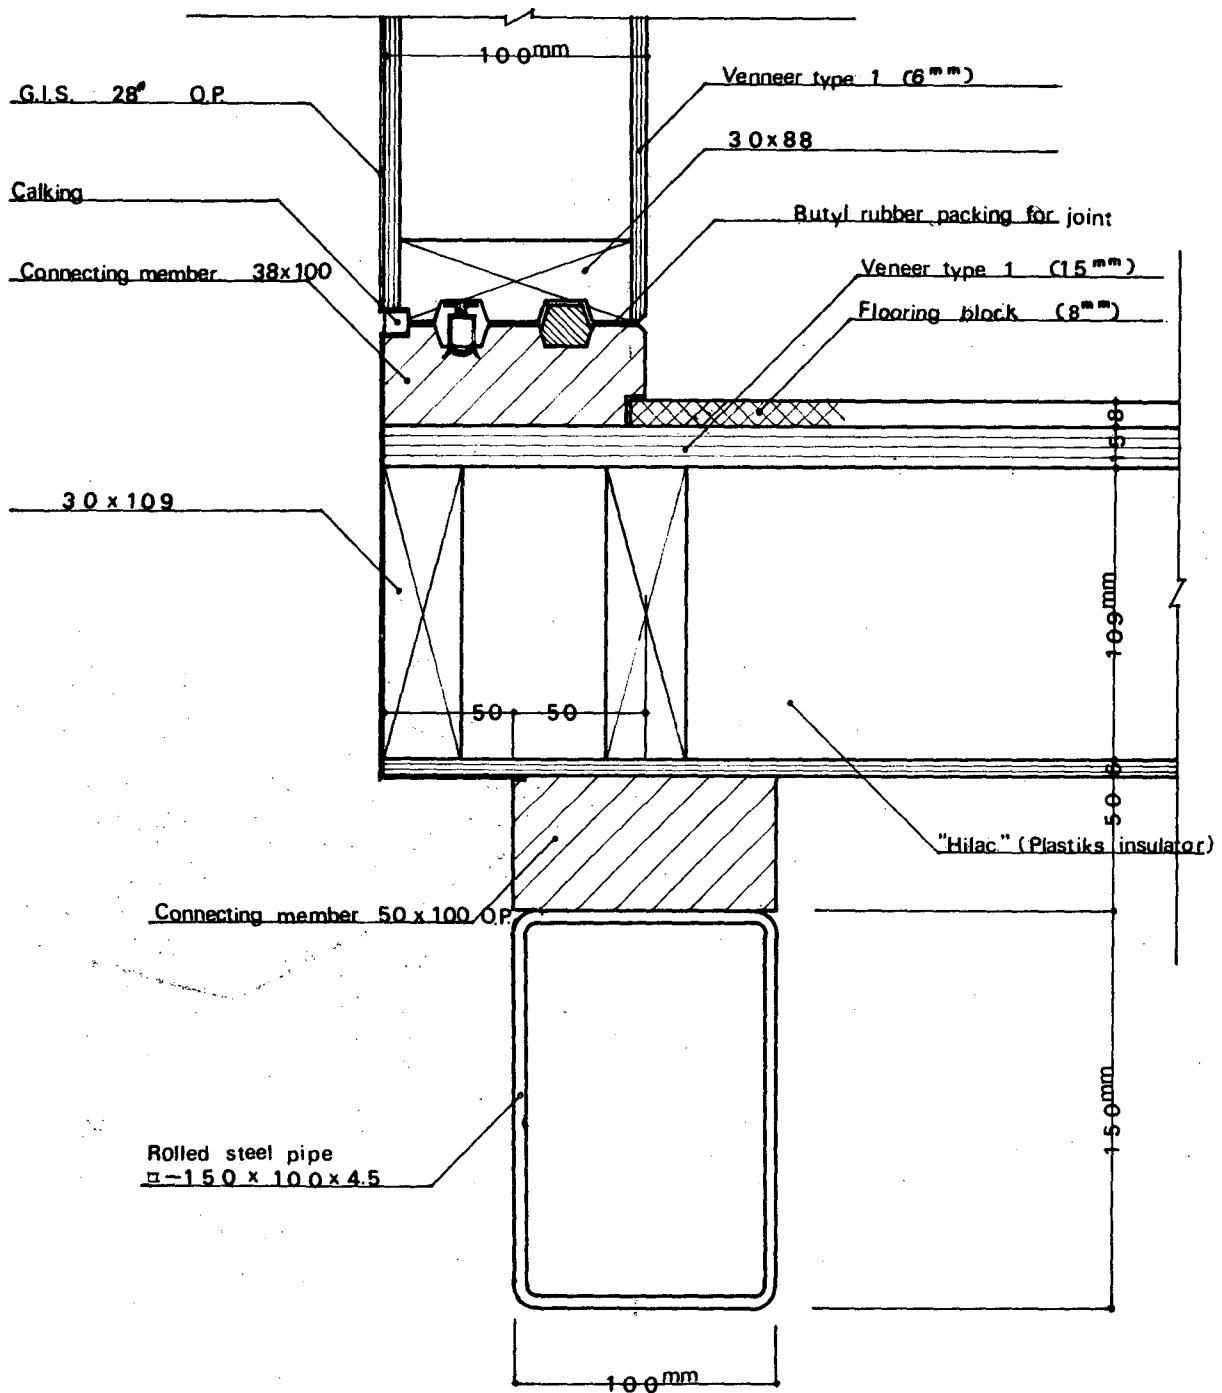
Details of connection between floor panel and superstructure (Living hut).
